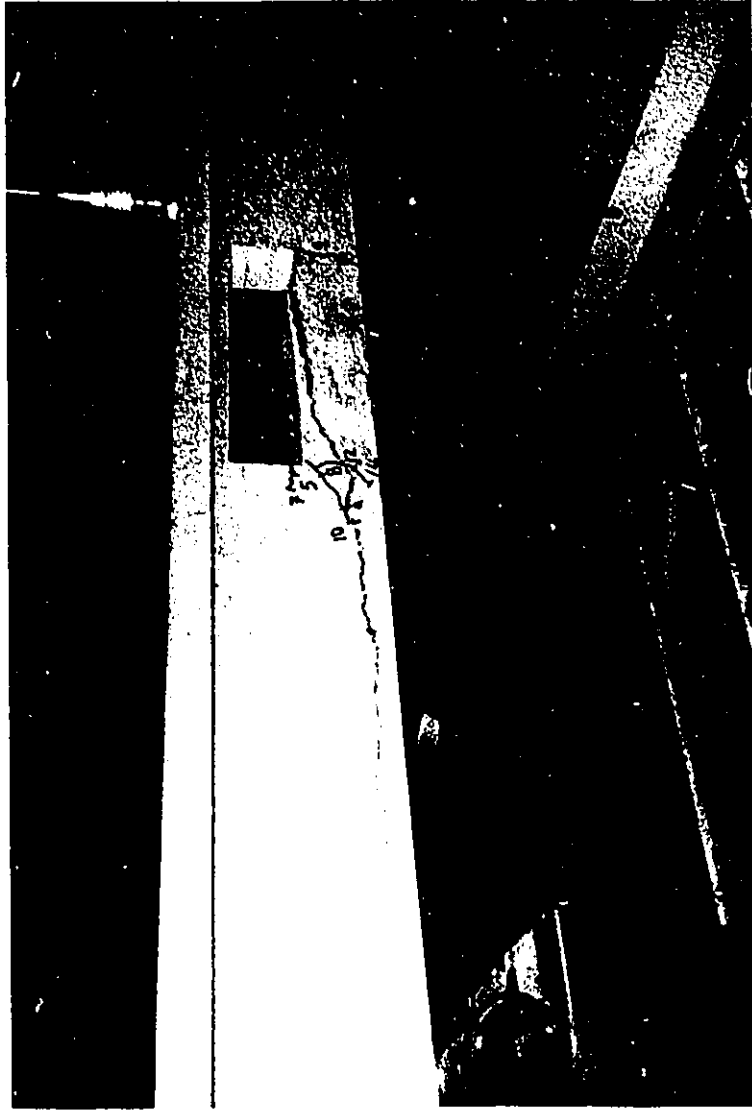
a FAILURE MODE FOR BEAM BIIIa
